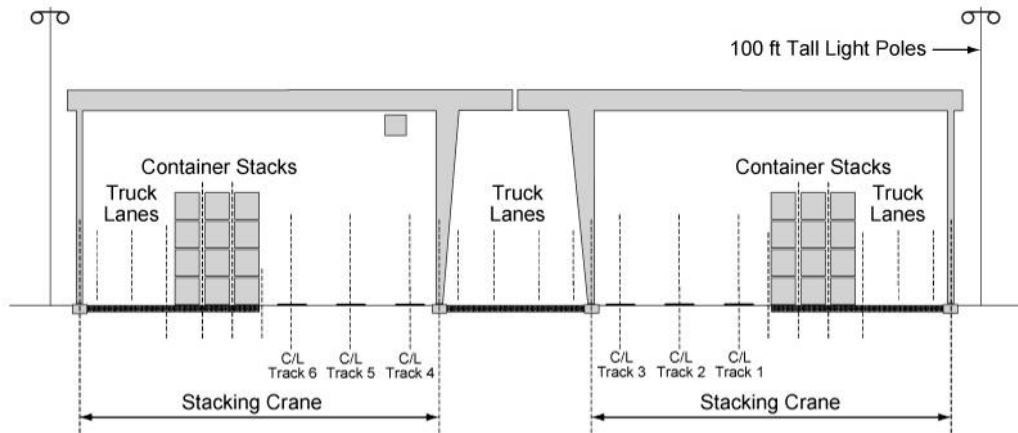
Typical intermodal rail yard cross section with stacking RMG cranes.
